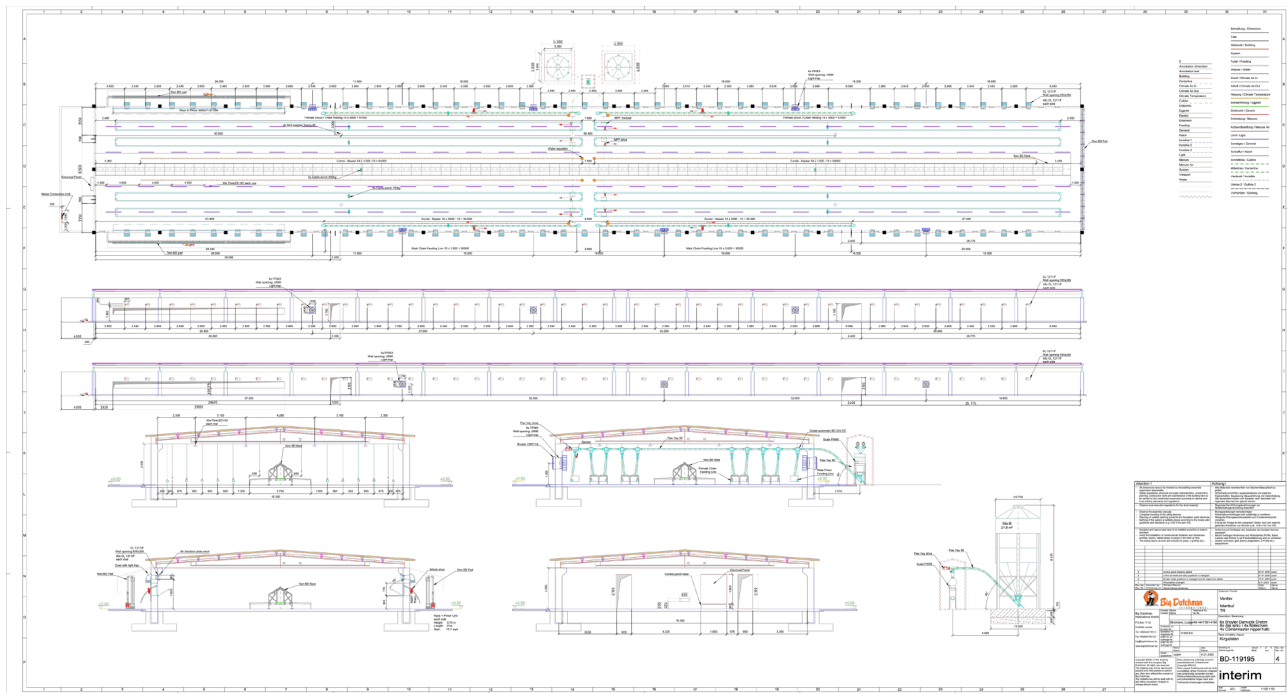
Poultry house plan and sections with equipment placement (Big Dutchman drawing, BD-119195, interim version, January 2025)
